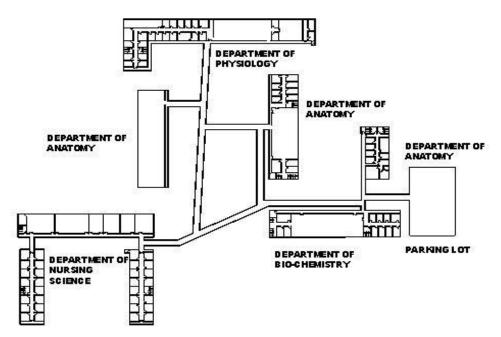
Typical first floor plans of the Faculty of Medicine U.J Source: Author's fieldwork, 2016.
